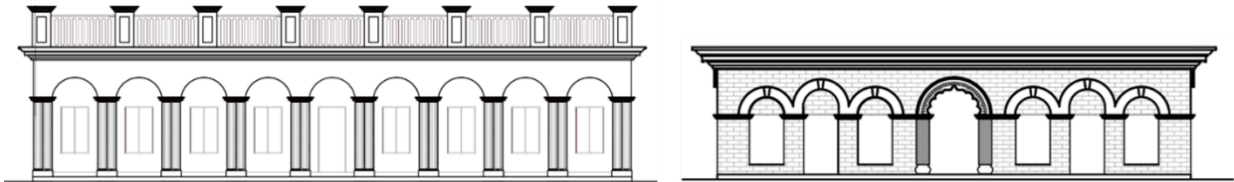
Andarmahal Elevation (left) and Kachari House Elevation (right) (Source: Author).
